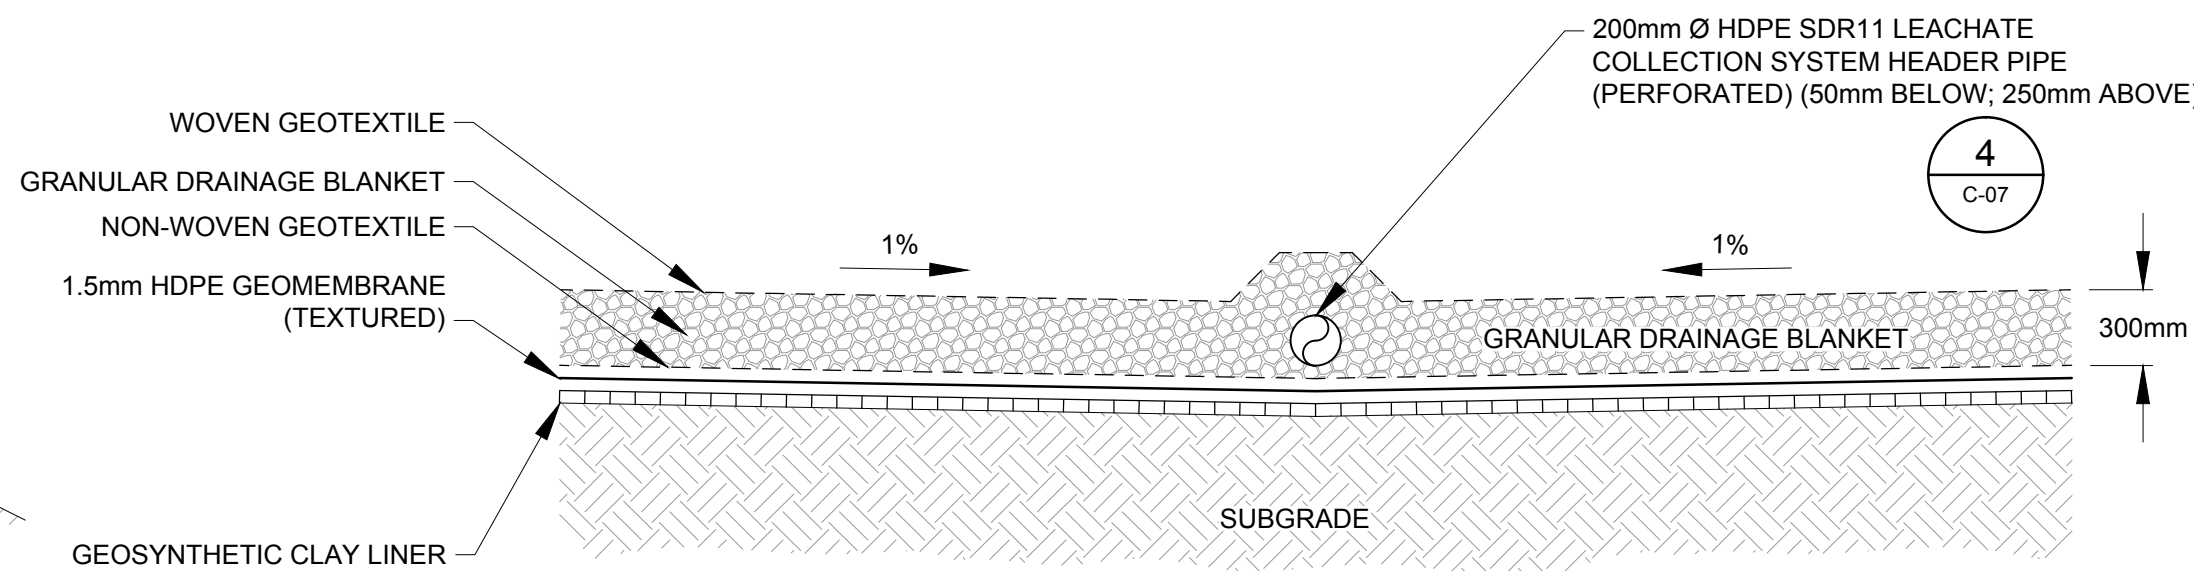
LEACHATE COLLECTION SYSTEM TOE DRAIN / LEACHATE COLLECTION SYSTEM PIPE PERFORATIONS
